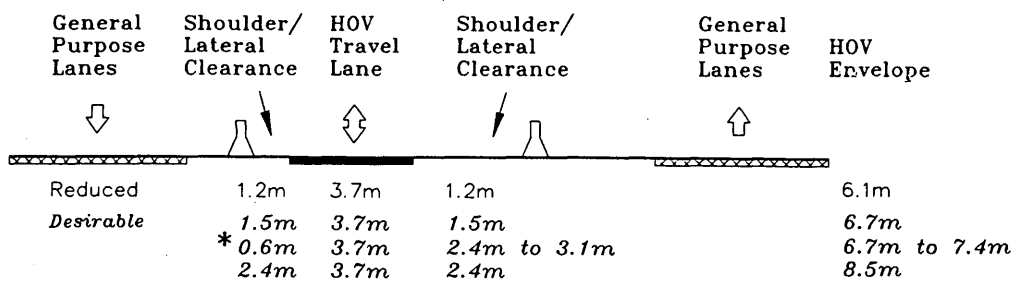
shows how the envelope is typically striped for single-lane HOV facilities that are reversible. Equal distances on each side of the travel lane have been used to provide maximum separation from the barrier when insufficient width for a shoulder exists. The reduced envelope of 6.1 m (20 ft) is such a case. Disabled vehicles would be parked against one barrier and HOV lane traffic would pass on the other side, crossing over the shoulder stripe in the process. This operating plan has not posed any problems in the Houston HOV lane system, where this cross section has operated since 1984.
